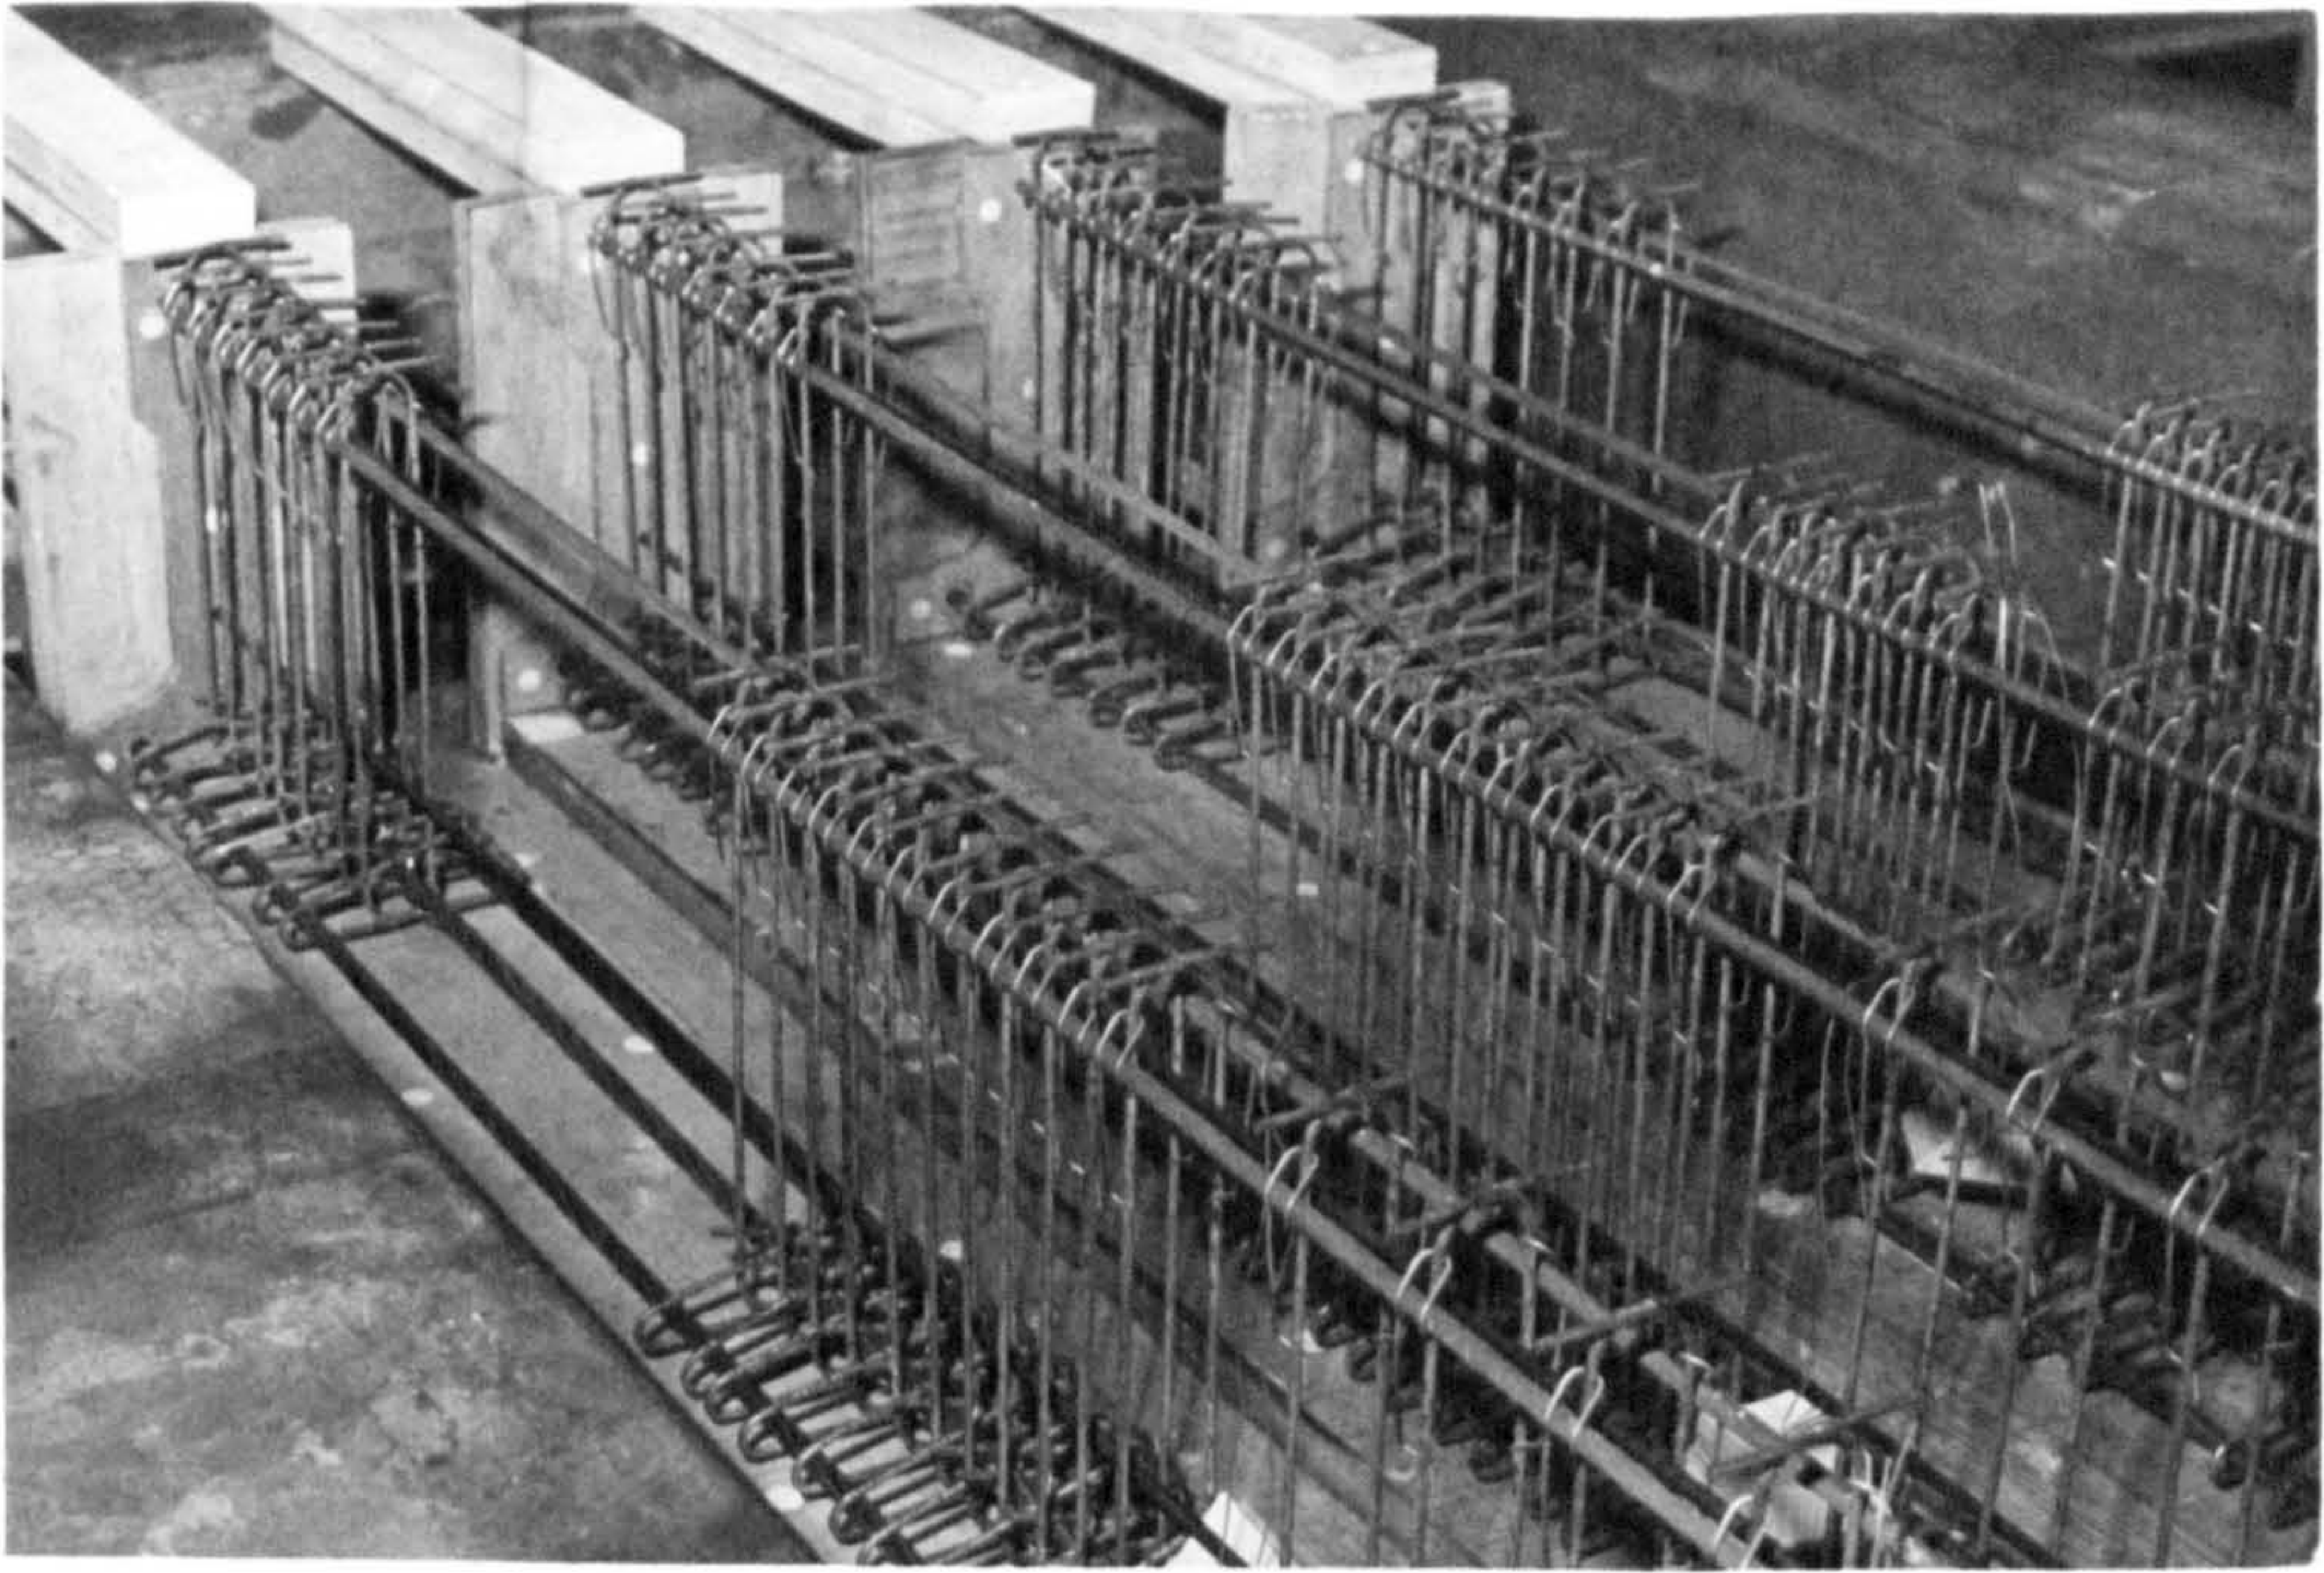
MODEL 2 CONSTRUCTION DETAILS
